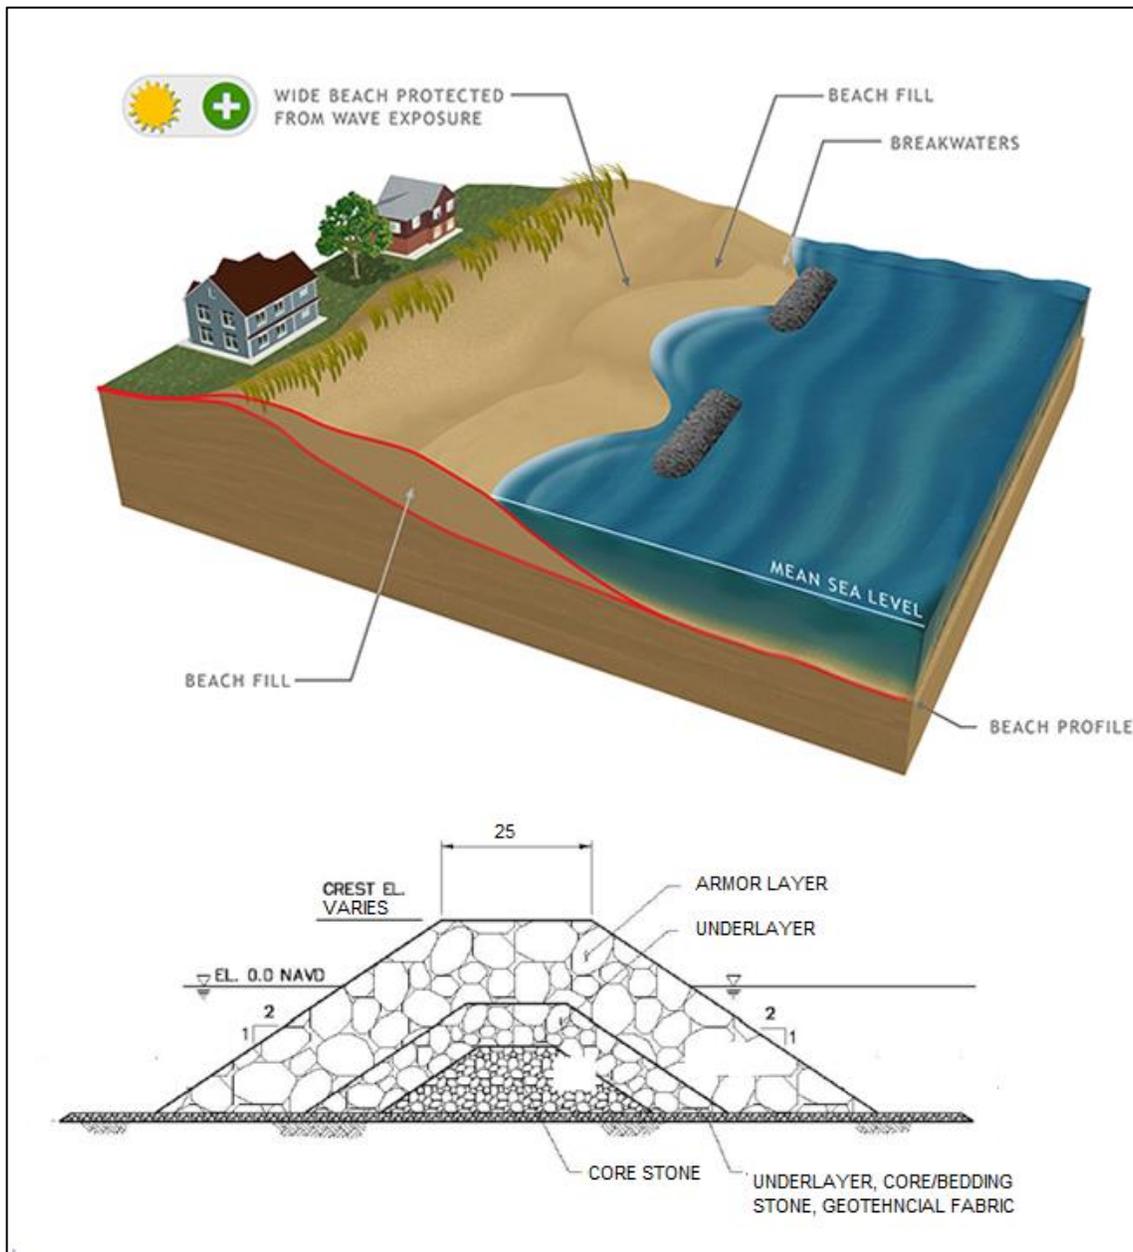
Example of Typical Breakwater Layout and Section (USACE 2015a)
